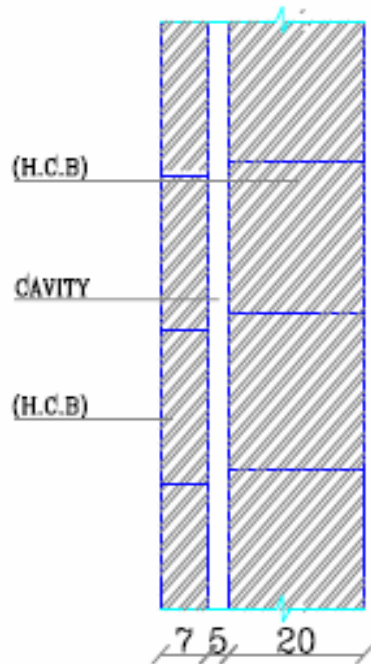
Exterior wall built from two walls of concrete blocks with 5cm cavity in between.
